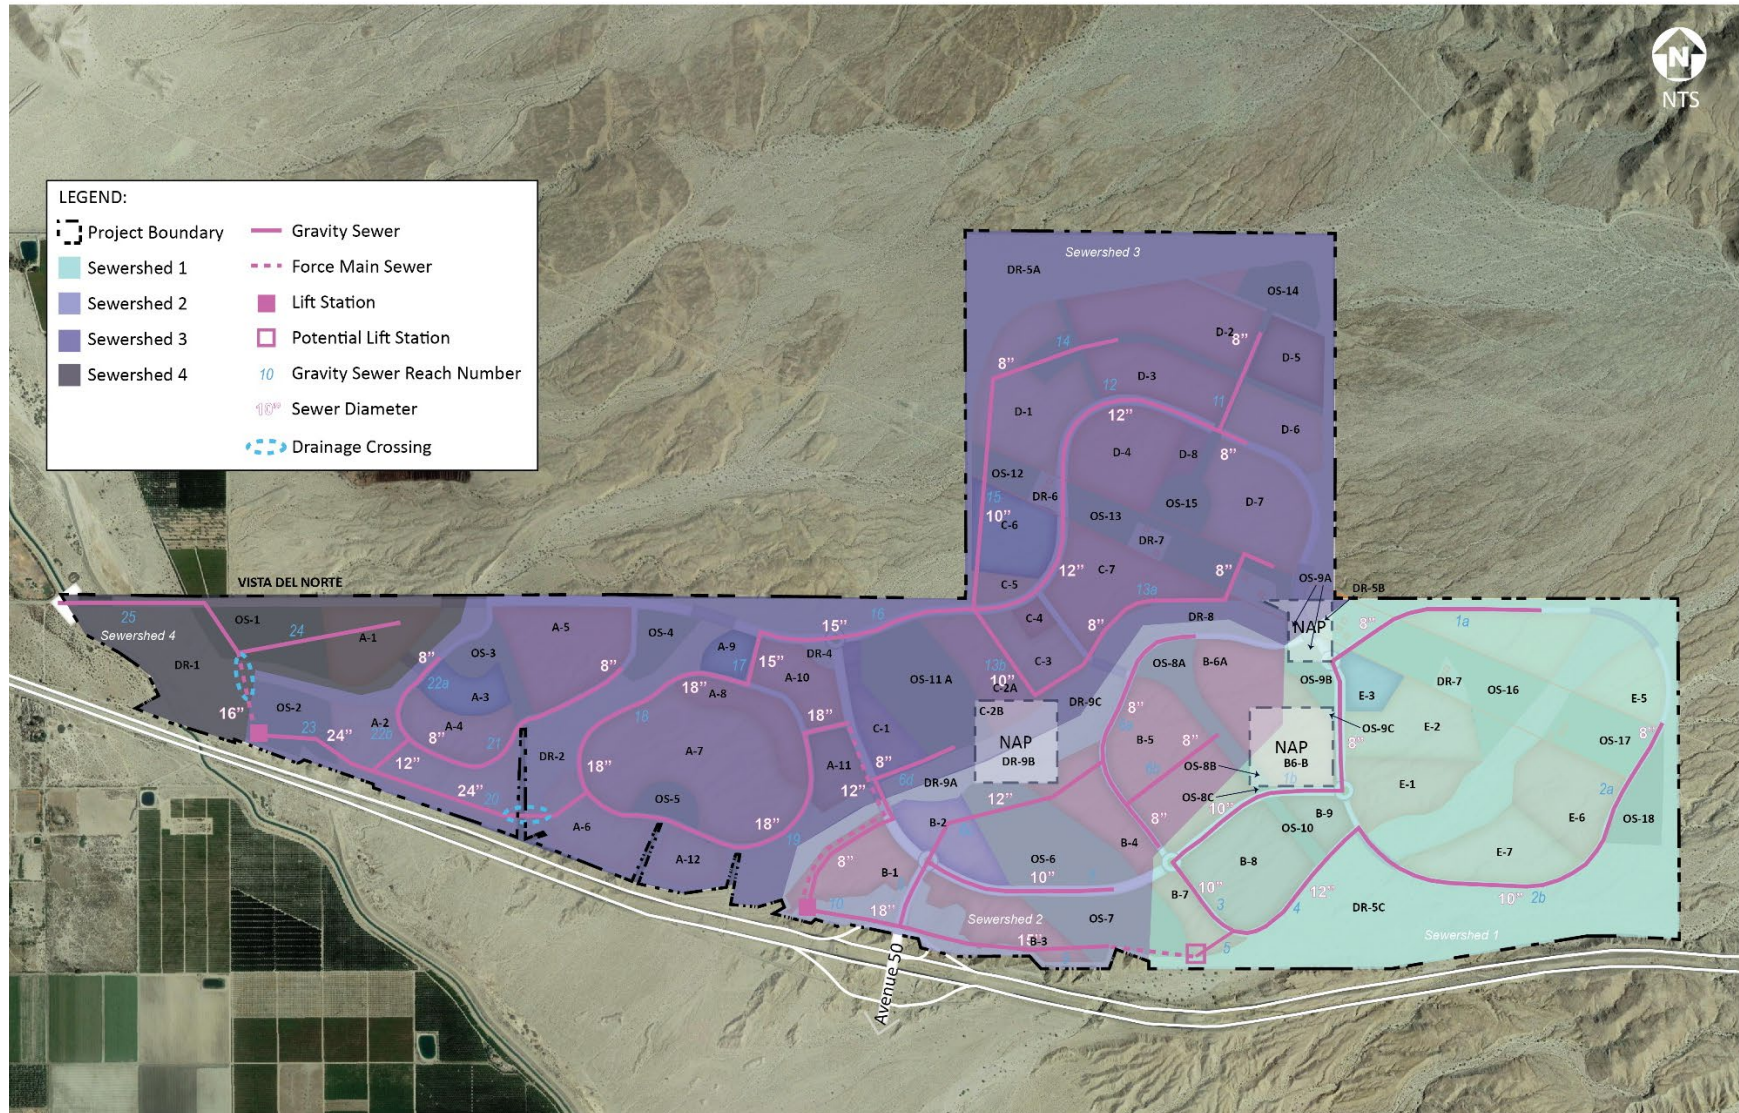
CONCEPTUAL SEWER PLAN
